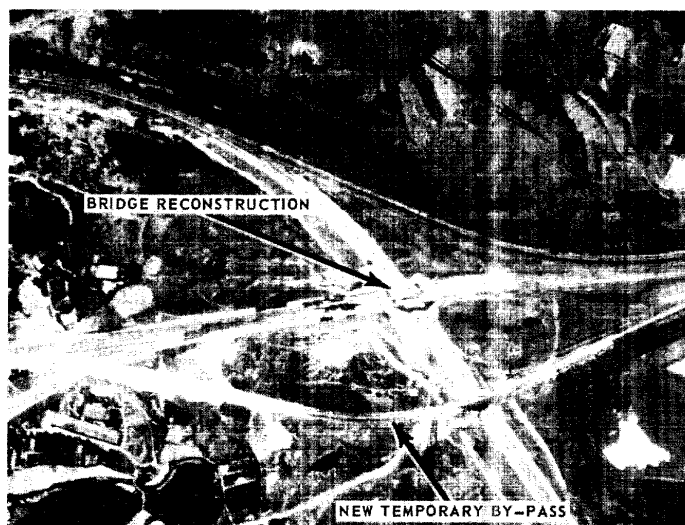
BRIDGE RECONSTRUCTION, [ ]
